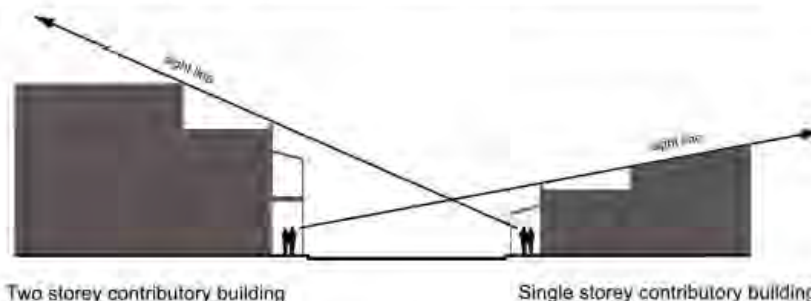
Indicative sight lines for upper floor additions to contributory places.
